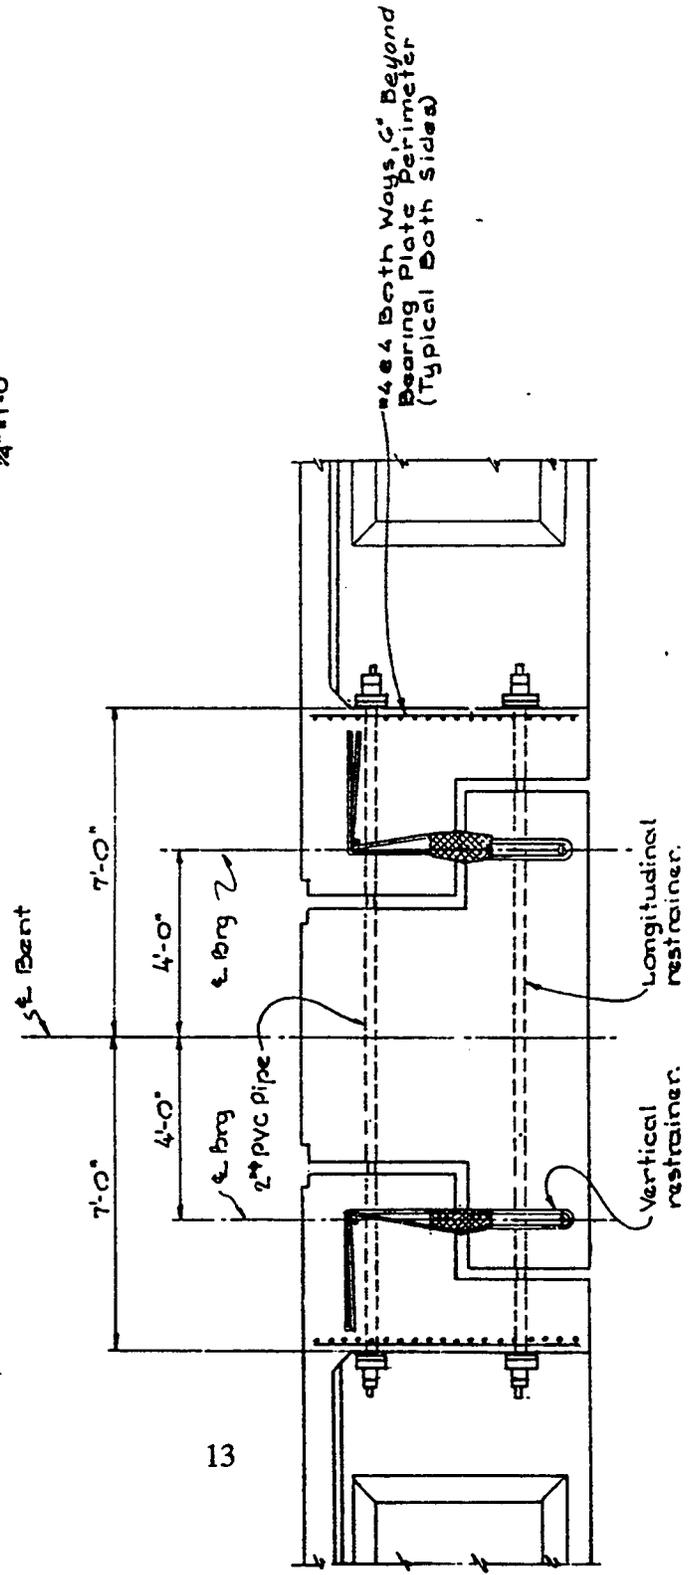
Cast-In-Place Box Girder Longitudinal and Vertical Restrainer Details (cont.)
